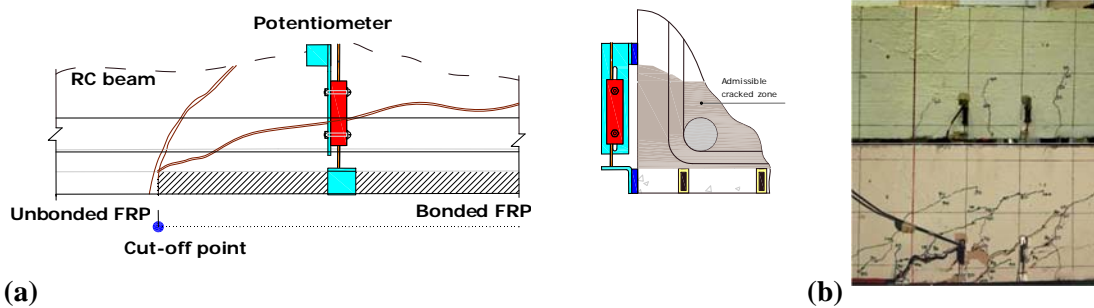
Details of (a) set up of LVDT group C, (b) LVDTs group C before and after debonding failure of the tested beam
